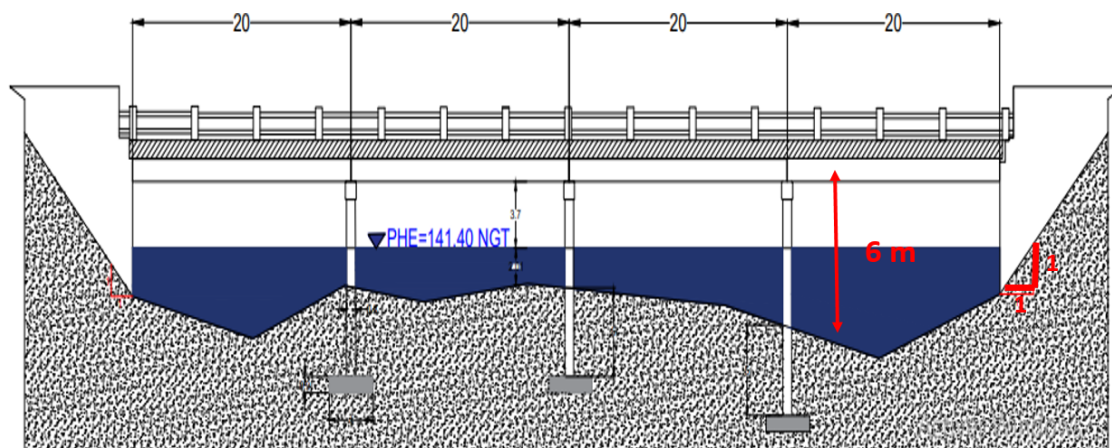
Cross section of the TIBA 4-span bridge to be projected
